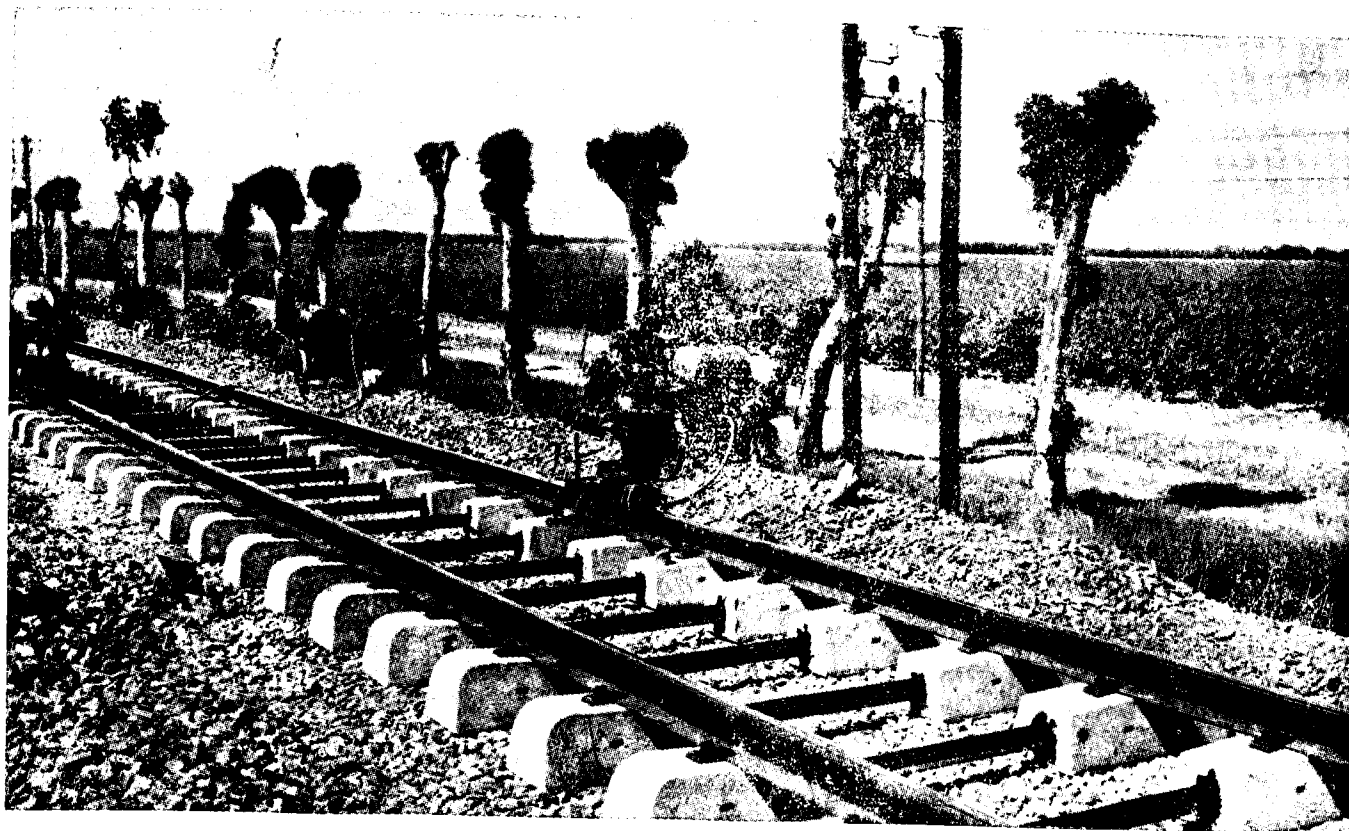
Welding of rails—Joints in preheating. All material necessary to a Welding is shown. The simplicity of process and material is demonstrated by this photo. 45 Weldings per day were made on this yard.
